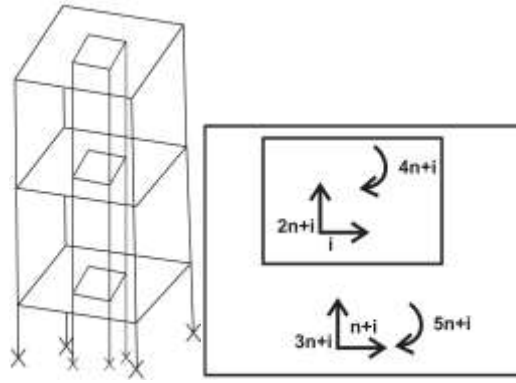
a) Schematic model of n-story building; b) DoF at i^{th} floor
